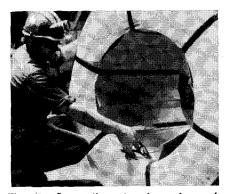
Once the strand package is placed in the dispenser the bands can be cut. This should be accomplished by using a band cutter or shears. The dispenser in this photograph has been removed to show the proper way the band cutters should be used. A cutting wheel may damage the strand by nicking it; and a torch only reduces the strength of the strand but can ignite the wrapping paper, resulting in a costly fire.
